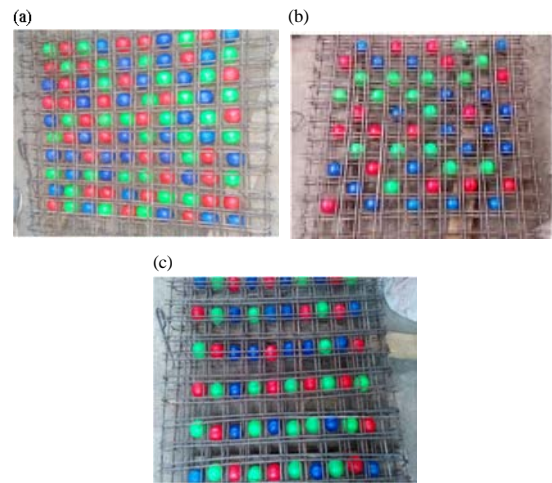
Experimental variables of Bhade and Barelikar (2016): a) Continuous bubble deck slab; b) Alternative bubble deck slab (type 1) and c) Alternative bubble deck slab (type 2)
